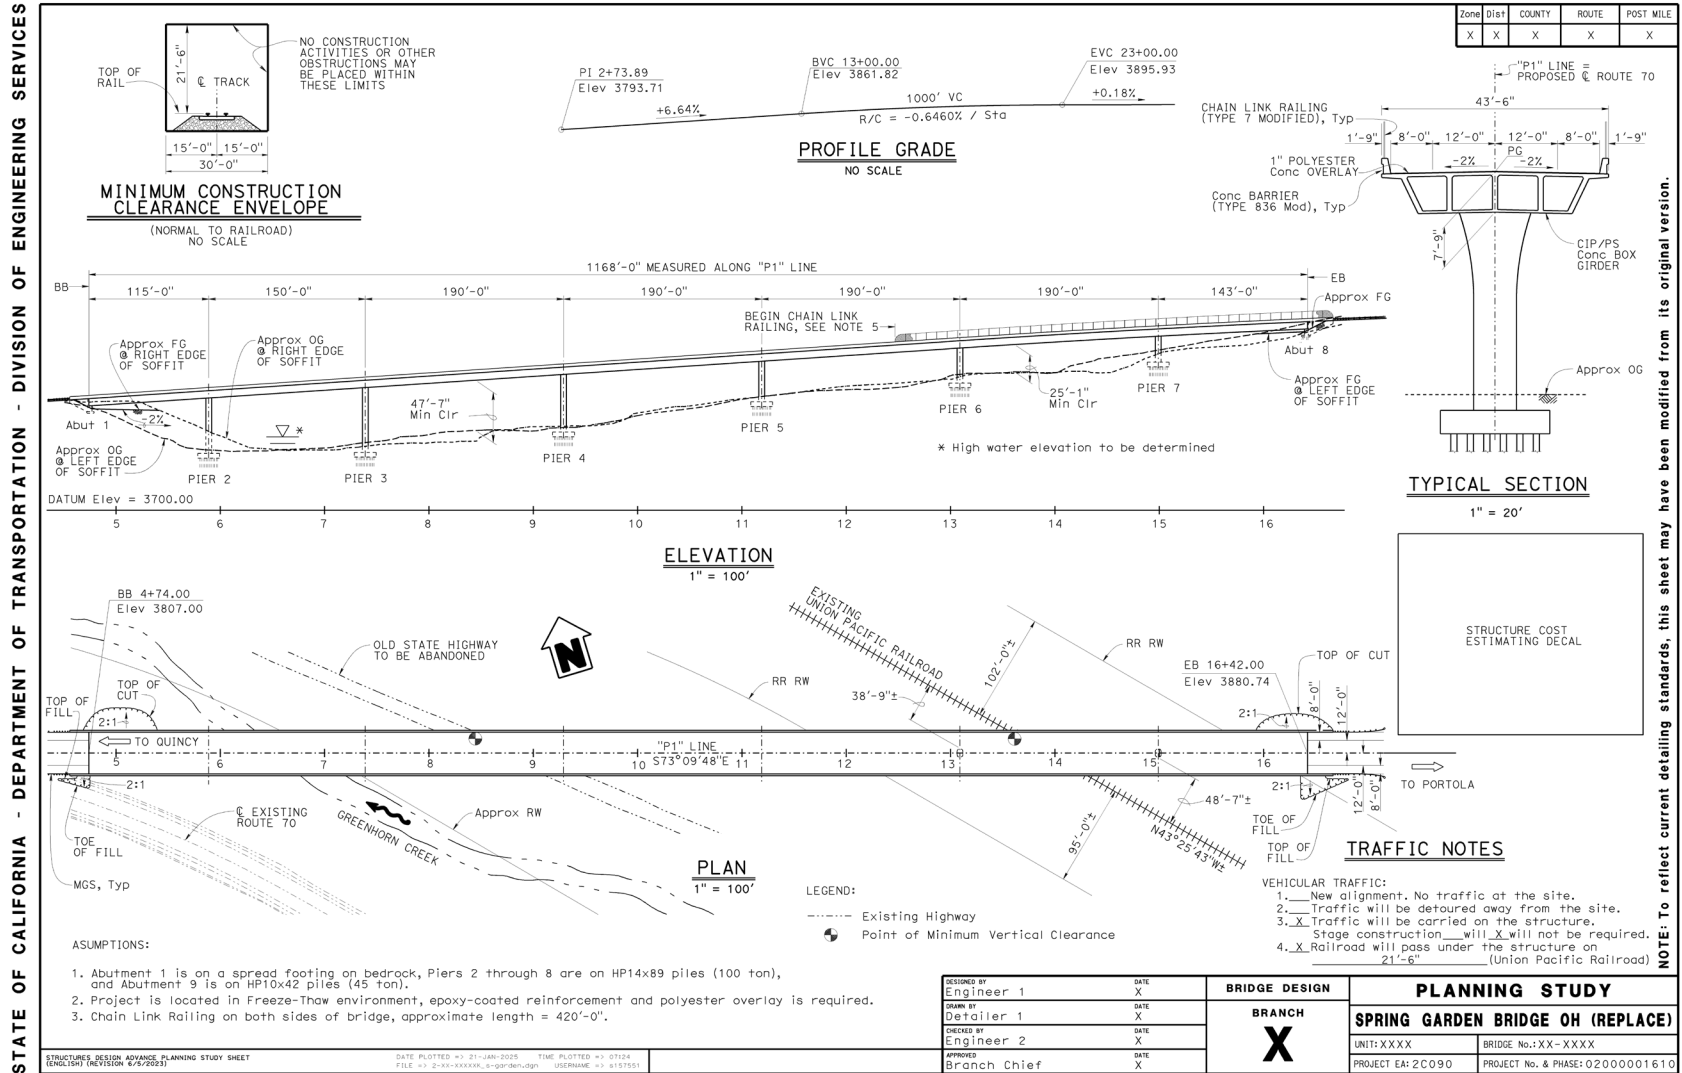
A.B.3 Advance Planning Study Detailing Example 3
